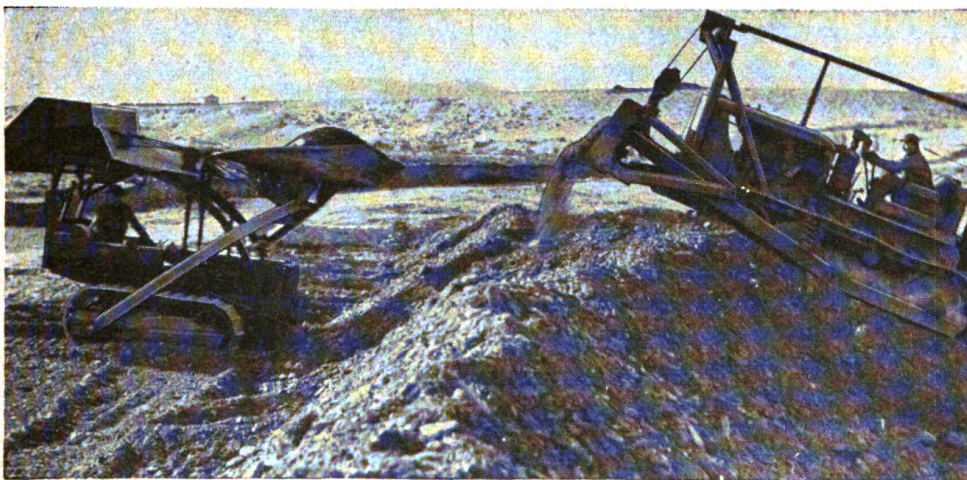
Angledozer and overhead bucket loader working in gravel pit. The angledozer is excavating and piling the gravel and the loader is loading dump trucks.
